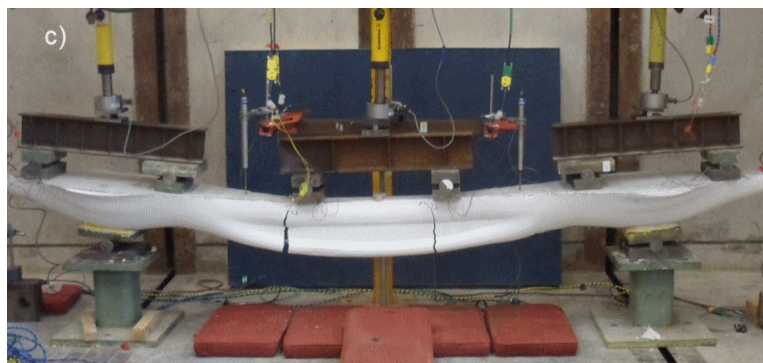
Failure of fabric formed beam reinforced with FRP reinforcement (Image courtesy: Kostova (2016))
